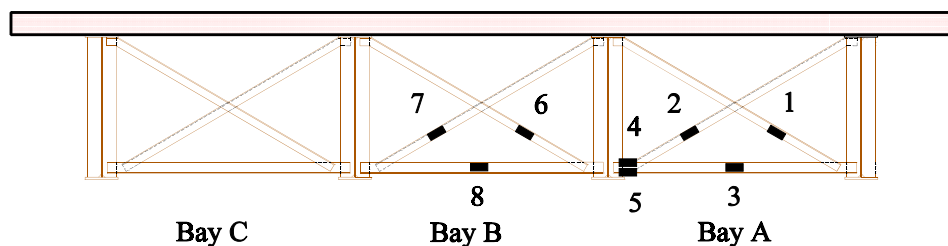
Gage Group 1, midspan diaphragm location (cross frame members).
